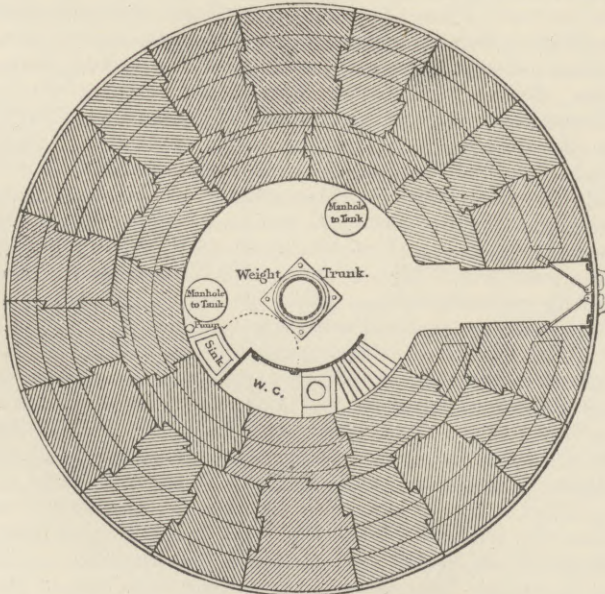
Plan of Entrance Floor, new Eddystone Lighthouse.
